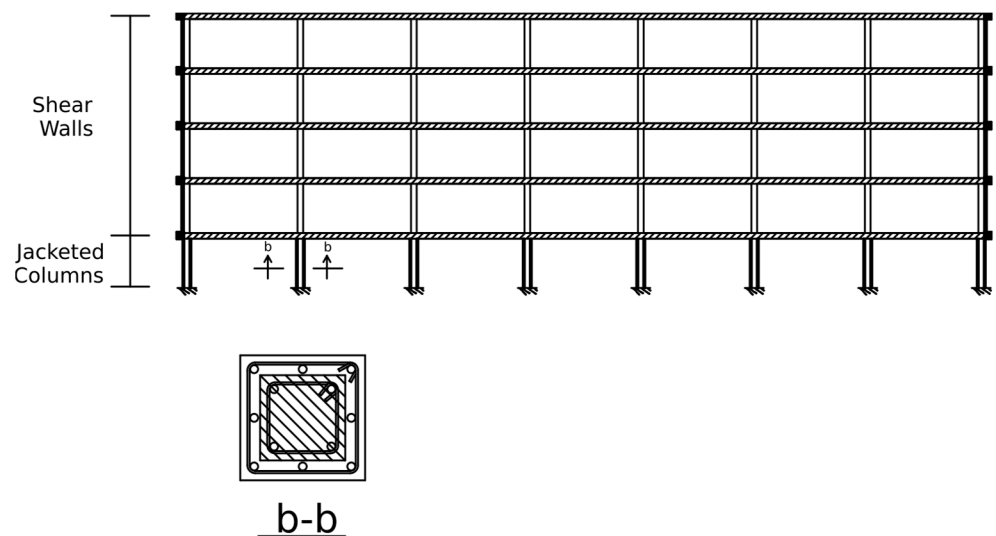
Reinforced concrete columns jacketing with shear walls strengthening (Case 2).
